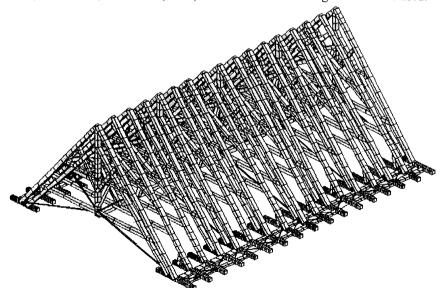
Isometric of FE-model with CFRP-tension and horizontal bracing
